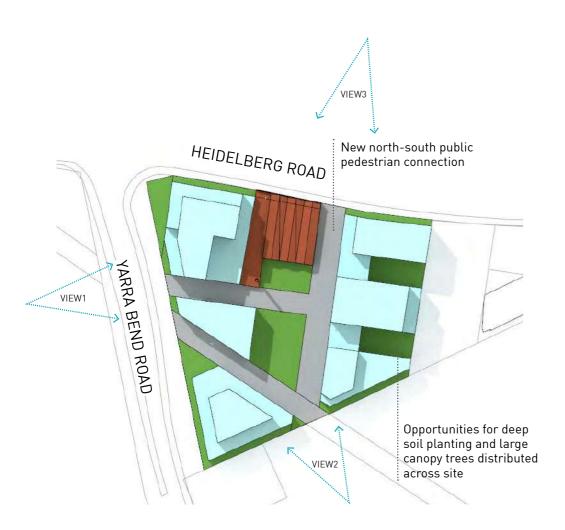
Built form testing - plan view with 2pm shadow at the equinox
